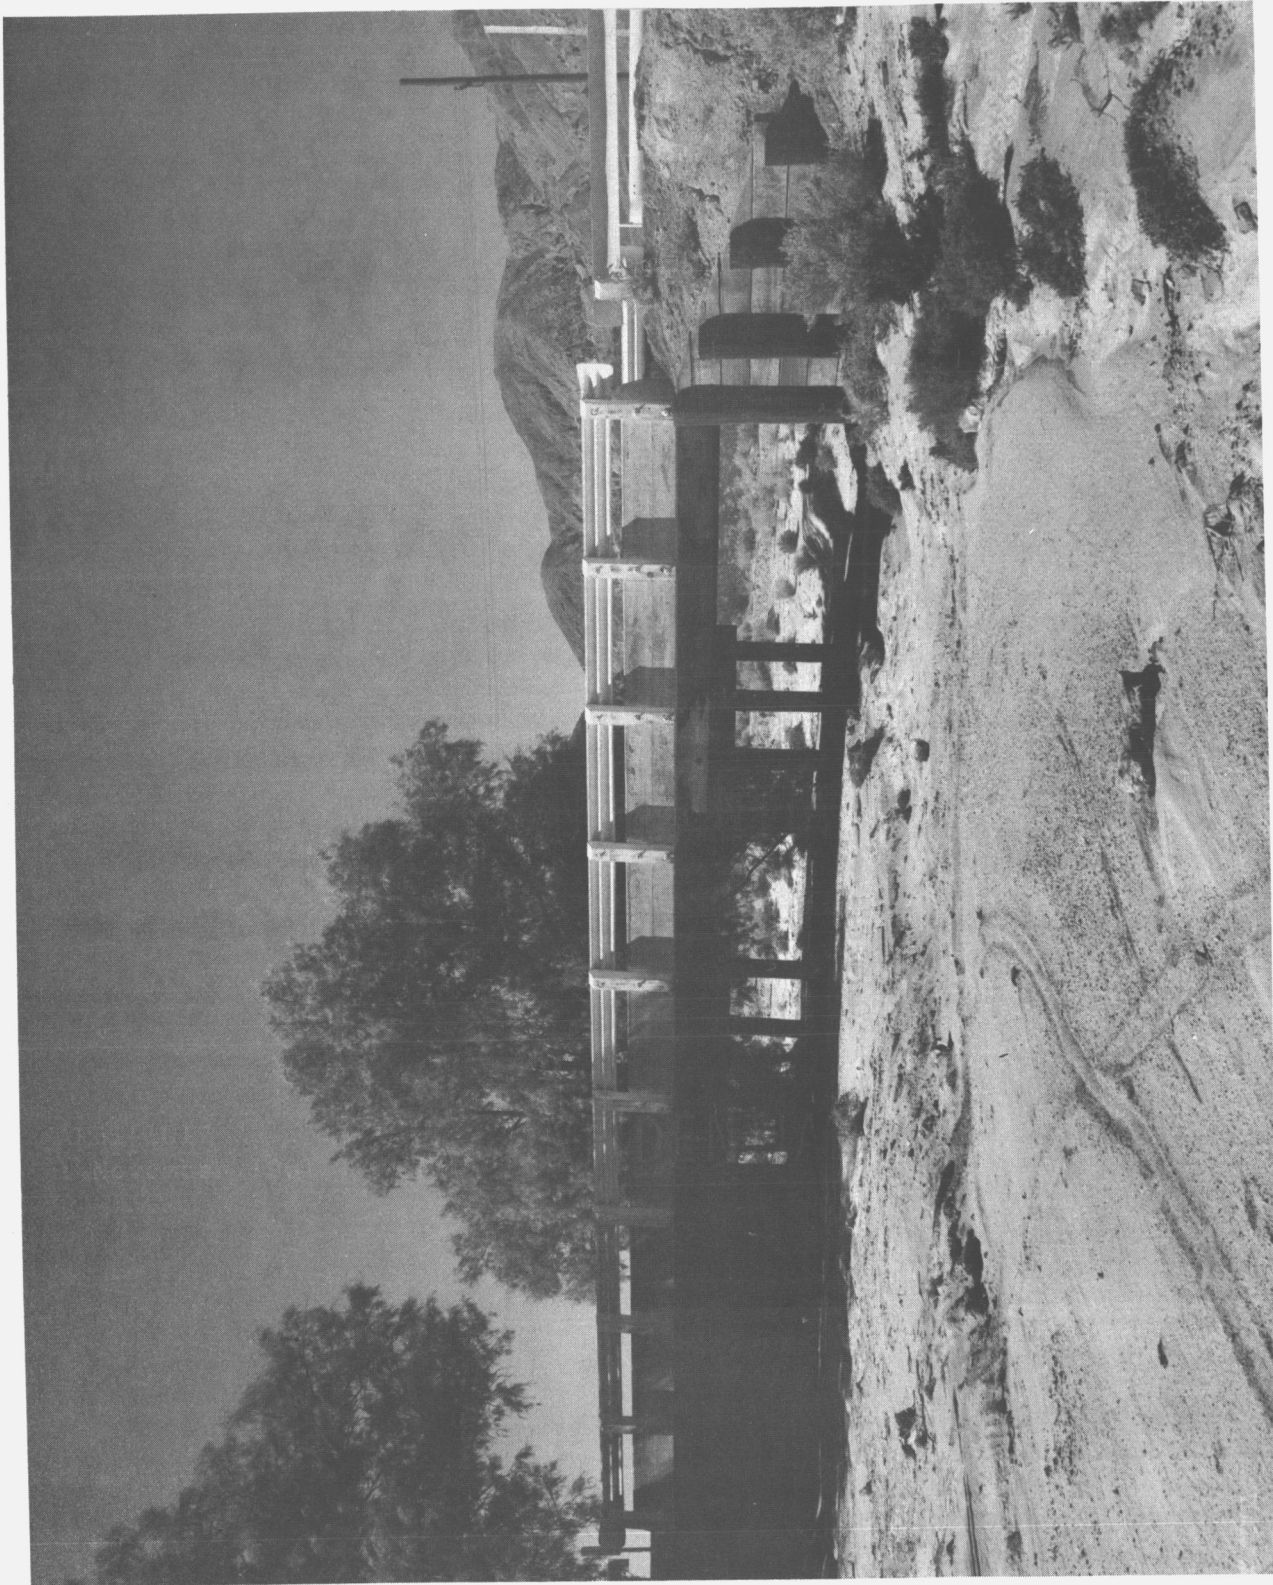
Bridge, 60 feet long, 12 miles east of Barstow on Highway 91/466
